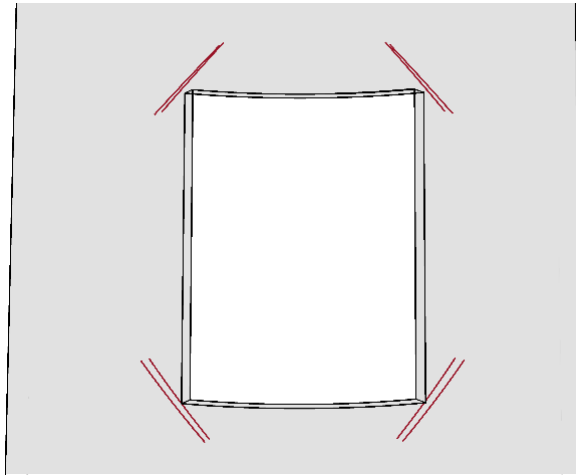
FE model of the diagonal opening corner reinforcements.
